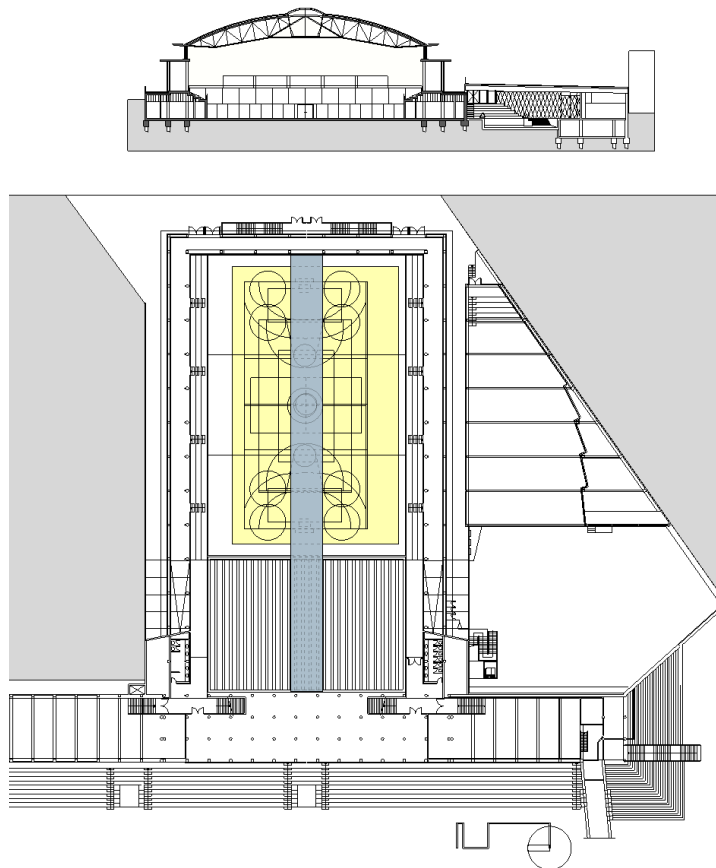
Floor plan and cross section (North-South) of the Centre Municipal Esportiu l'Espanya Industrial - CEM EI building.
